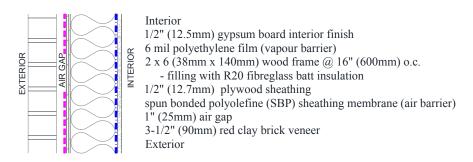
Cross-section of the Brick Veneer Rain Screen wall system
